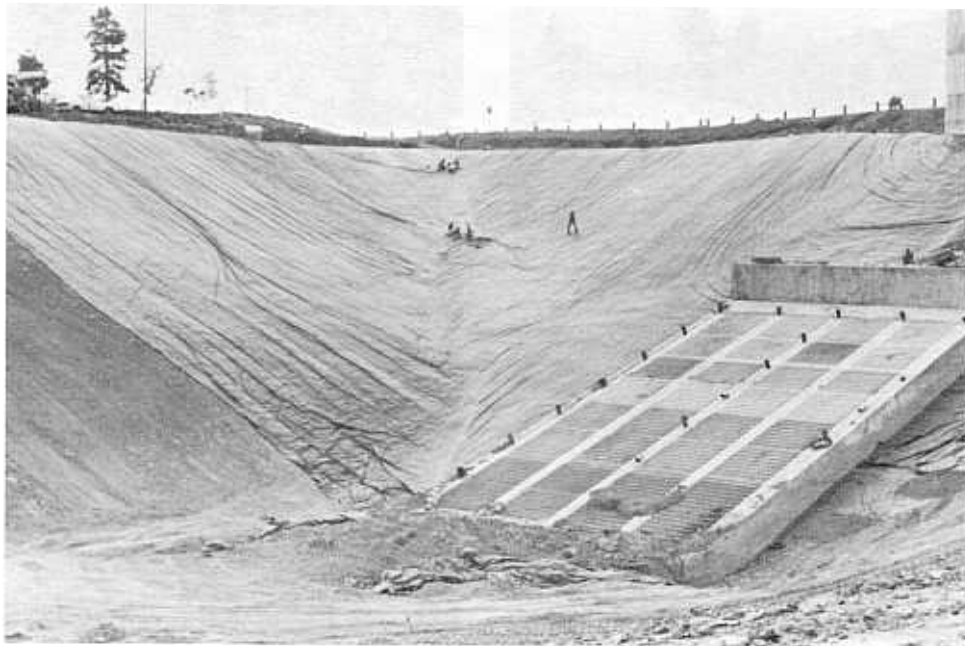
Membrane lining installation around the inlet-outlet structure. Photo P-382-706-28466 NA
